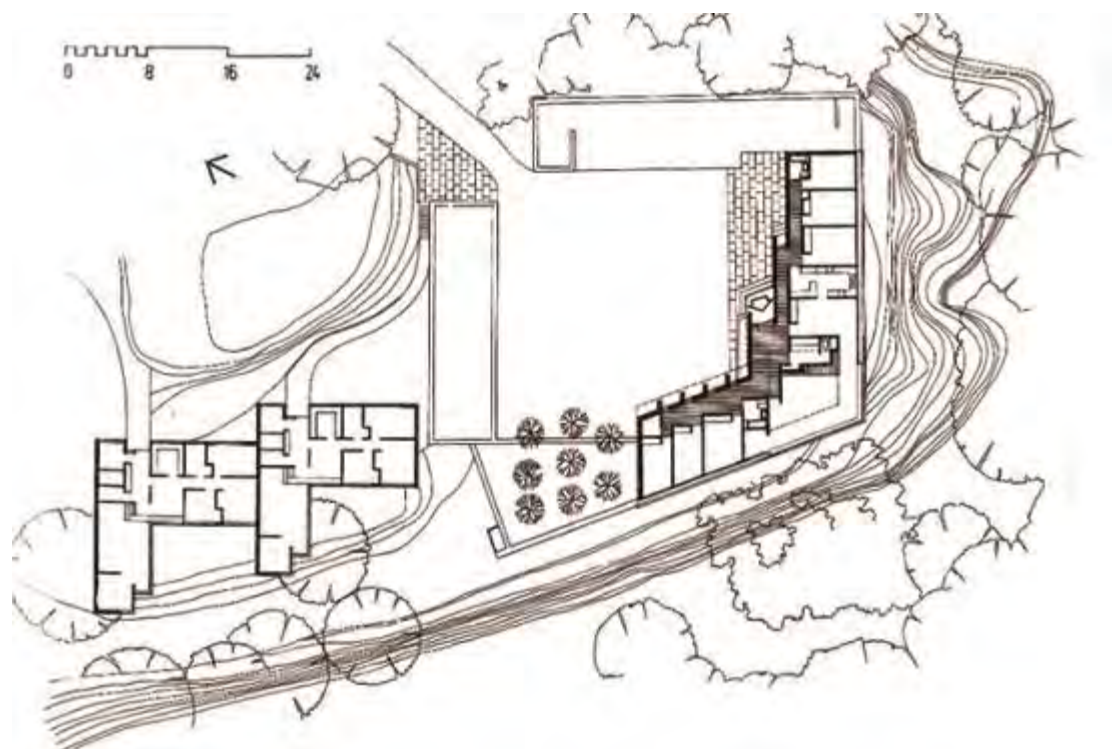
Undated site plan showing the layout of the Nuffield Houses in relation to the Principal's House. Note original arrangement of the study space off the main reception room in the Principal's House, and steps to the main entrance 1960s-70s. *Robert Steedman
